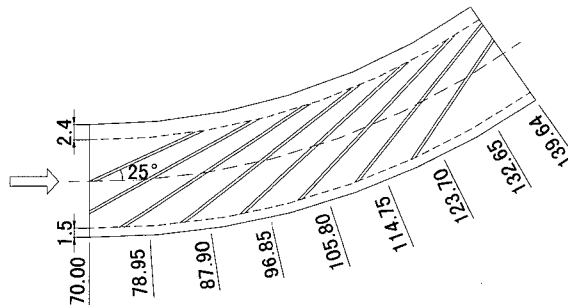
Layout of skew sills in the first curved conduit (unit: m)
